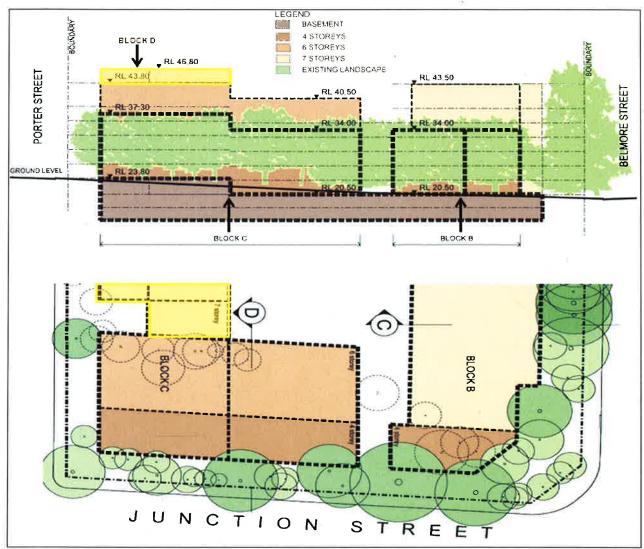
Northern elevation (top) and sectional site plan (bottom) from Junction Street showing Block C (left) and Block B (right) and Block D (left) in the background (yellow) (Base source: PPR)
